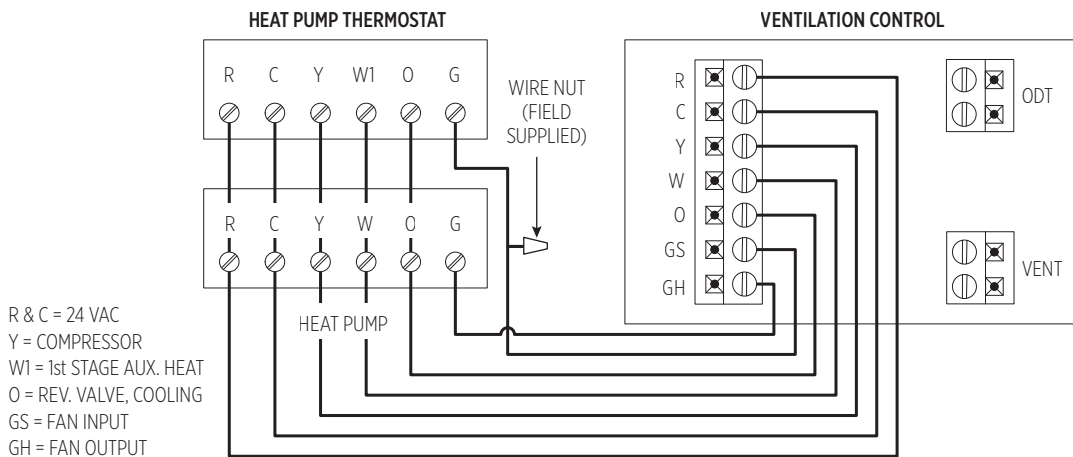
WIRING VENTILATION CONTROL TO A HEAT PUMP
